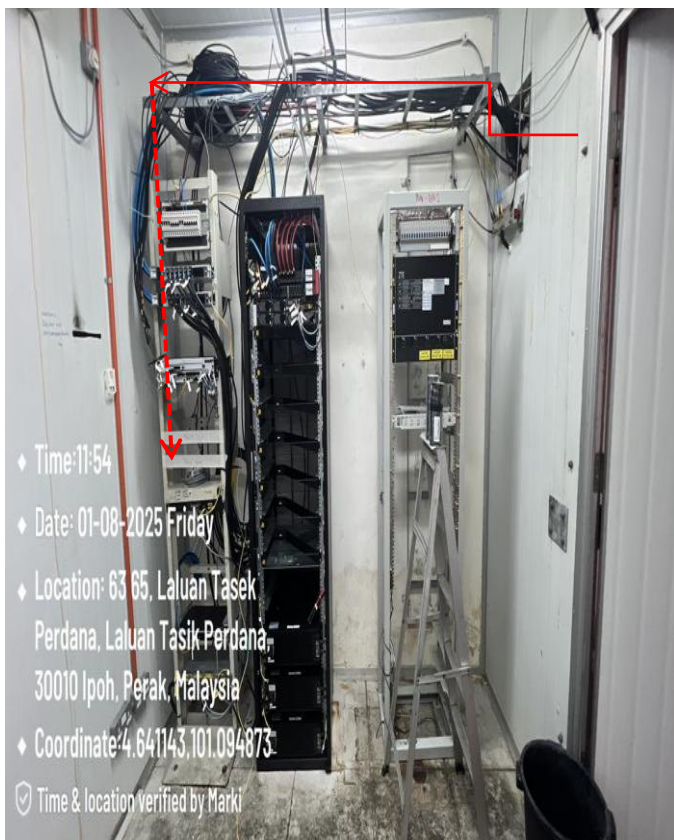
PROPOSE NEW HDD WORK TOWARDS UM SITE
